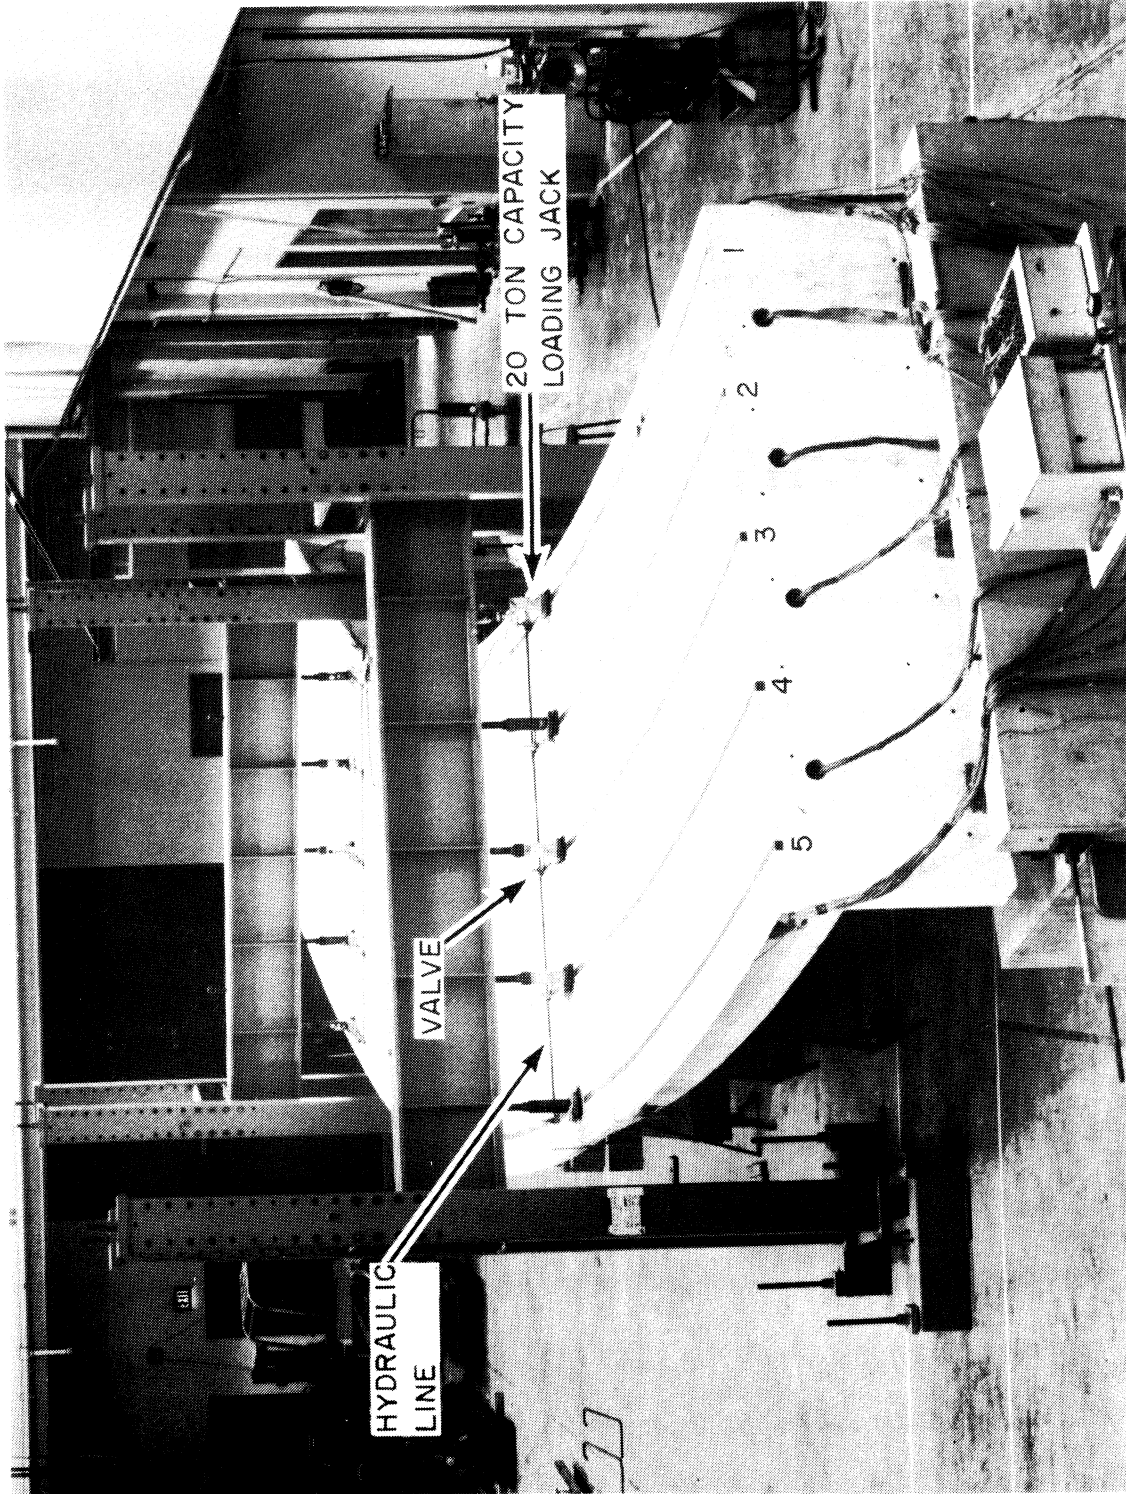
MIDSPAN LOADING FRAMES WITH TEN 20 TON JACKS IN POSITION
